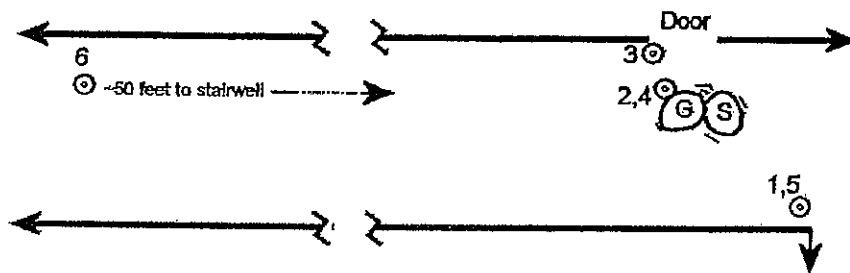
Sketch of damaged second floor hall outside of stairwell, Dr. John C. Page School, 694 Main St., West Newbury, MA showing locations of concrete core samples (#'s 1 - 6) and areas where the historic sand-bed (S) and more recent Gypcrete (G) floor repair materials were exposed. Not drawn to scale.
